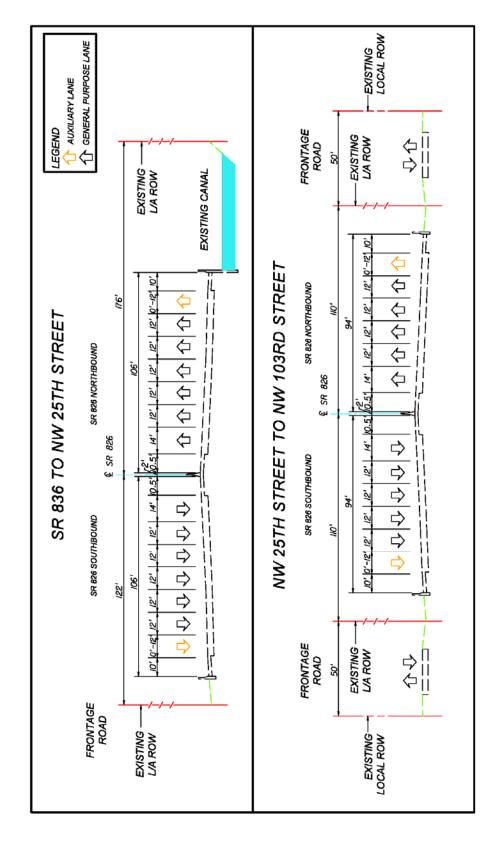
SR 826 Existing Ten and Twelve-Lane Divided Typical Sections
